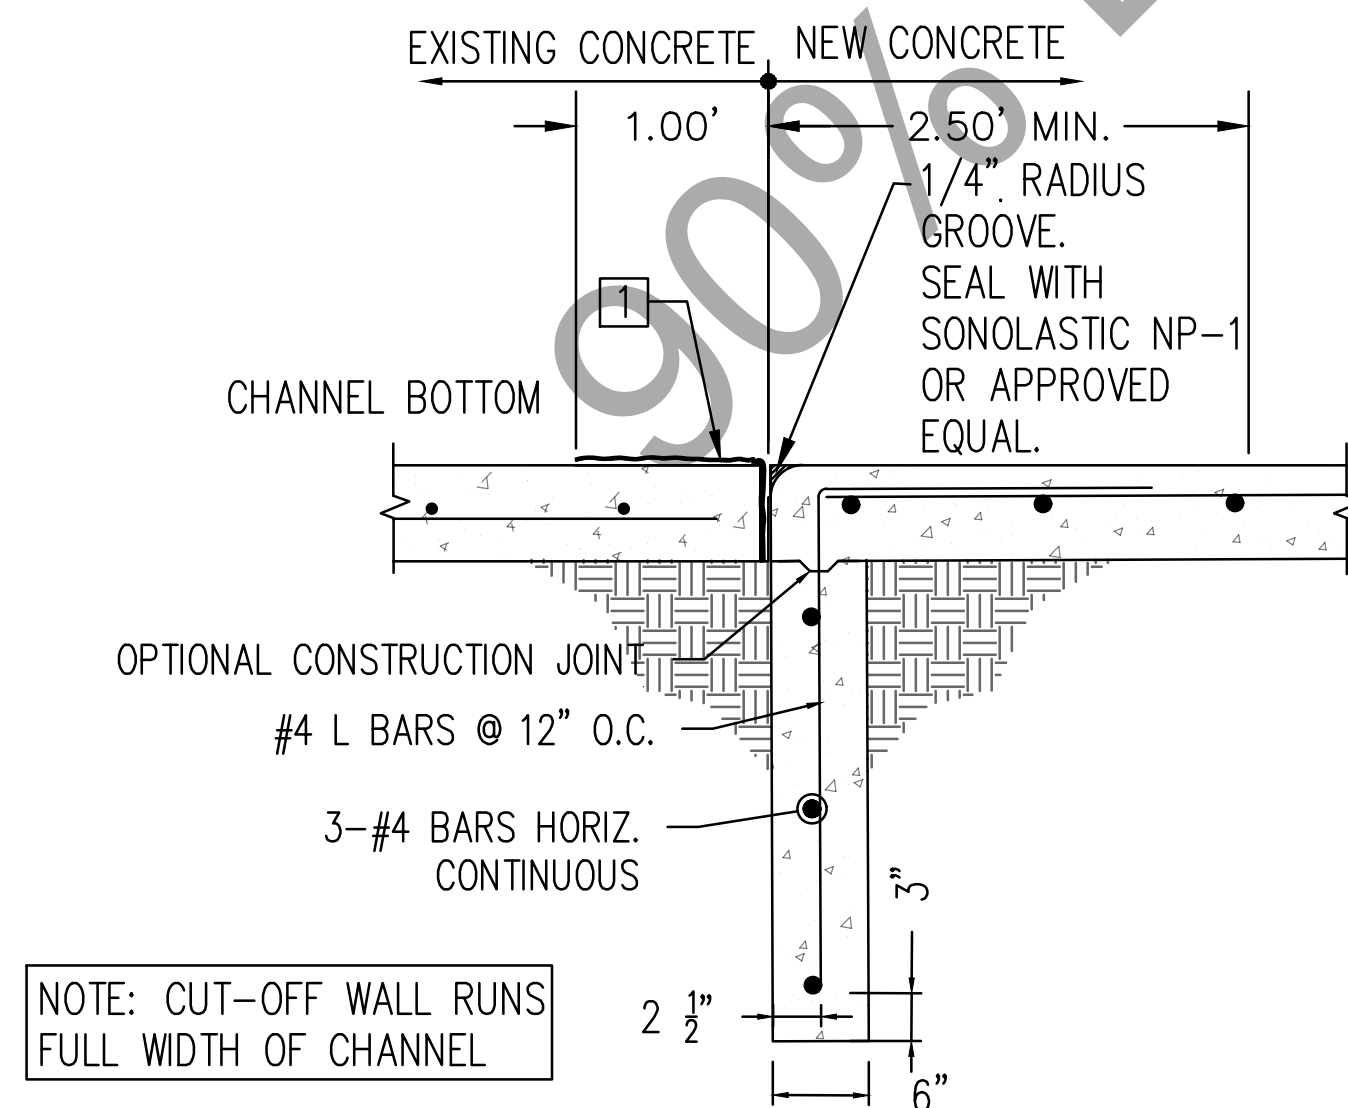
DETAIL D: TYPICAL TRANSVERSE CONSTRUCTION JOINT
